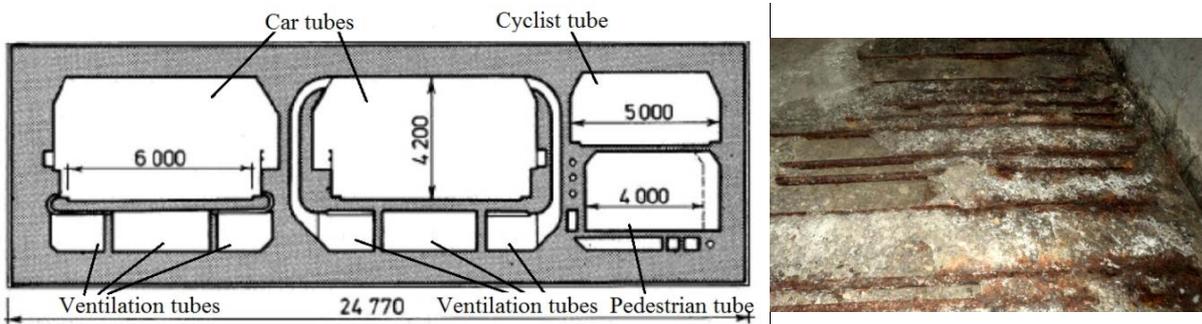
The Maastunnel a) Cross section of the tunnel b) chloride induced corrosion damage in ventilation tubes.
